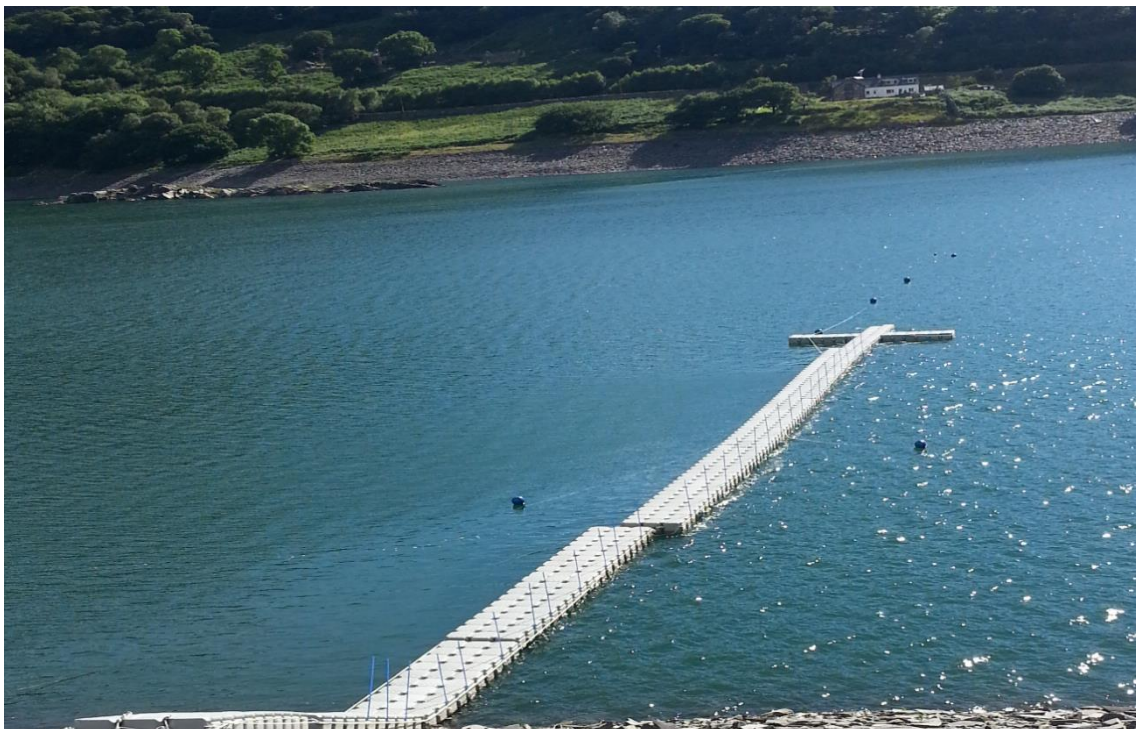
Pontoon construction and view of the test area from the shore side cabin
